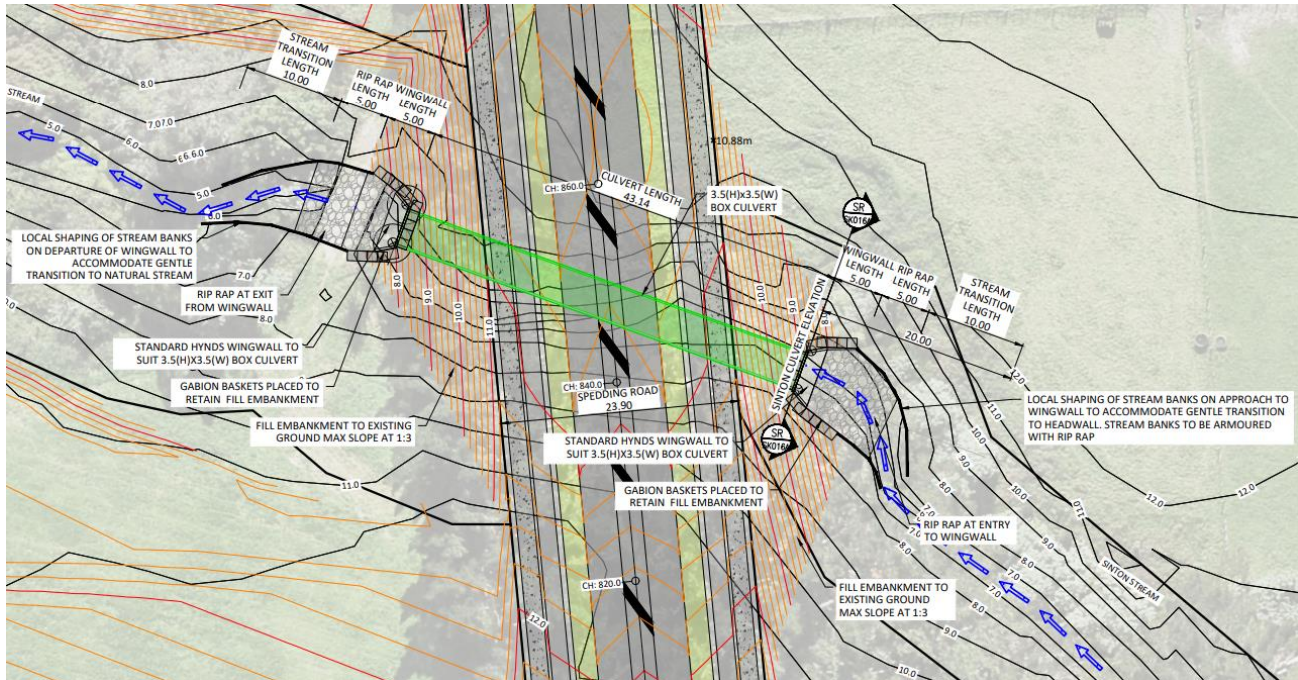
Sinton Stream Culvert (snip from Drawing SK016, Crang Civil Consulting Engineers, provided in Appendix A)
